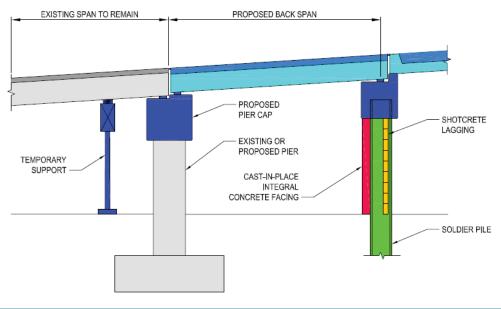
Proposed Back Span. Eliminates the need for an underpath structure to improve access and reduce maintenance.
